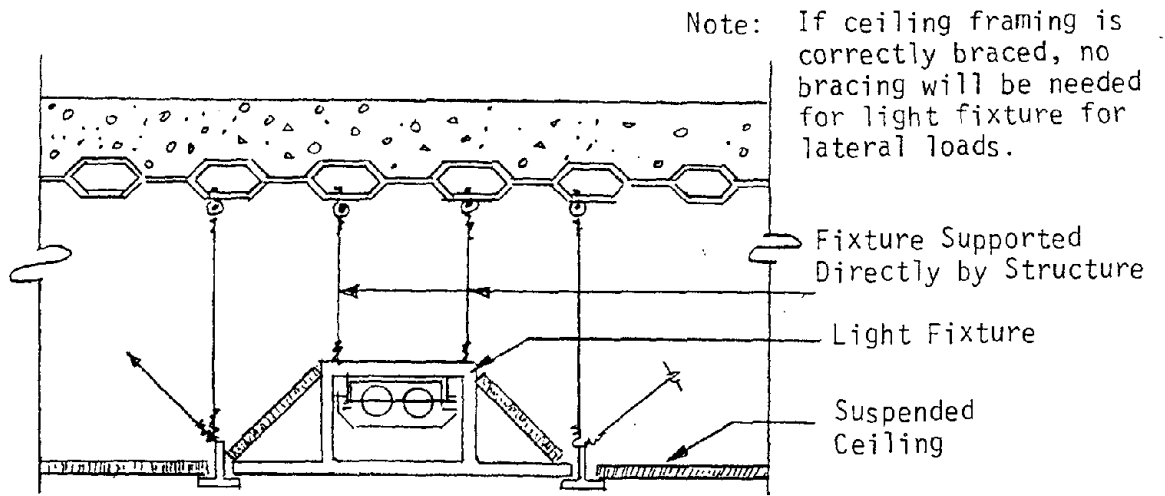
Suspended Ceiling Lighting Fixture (71)
